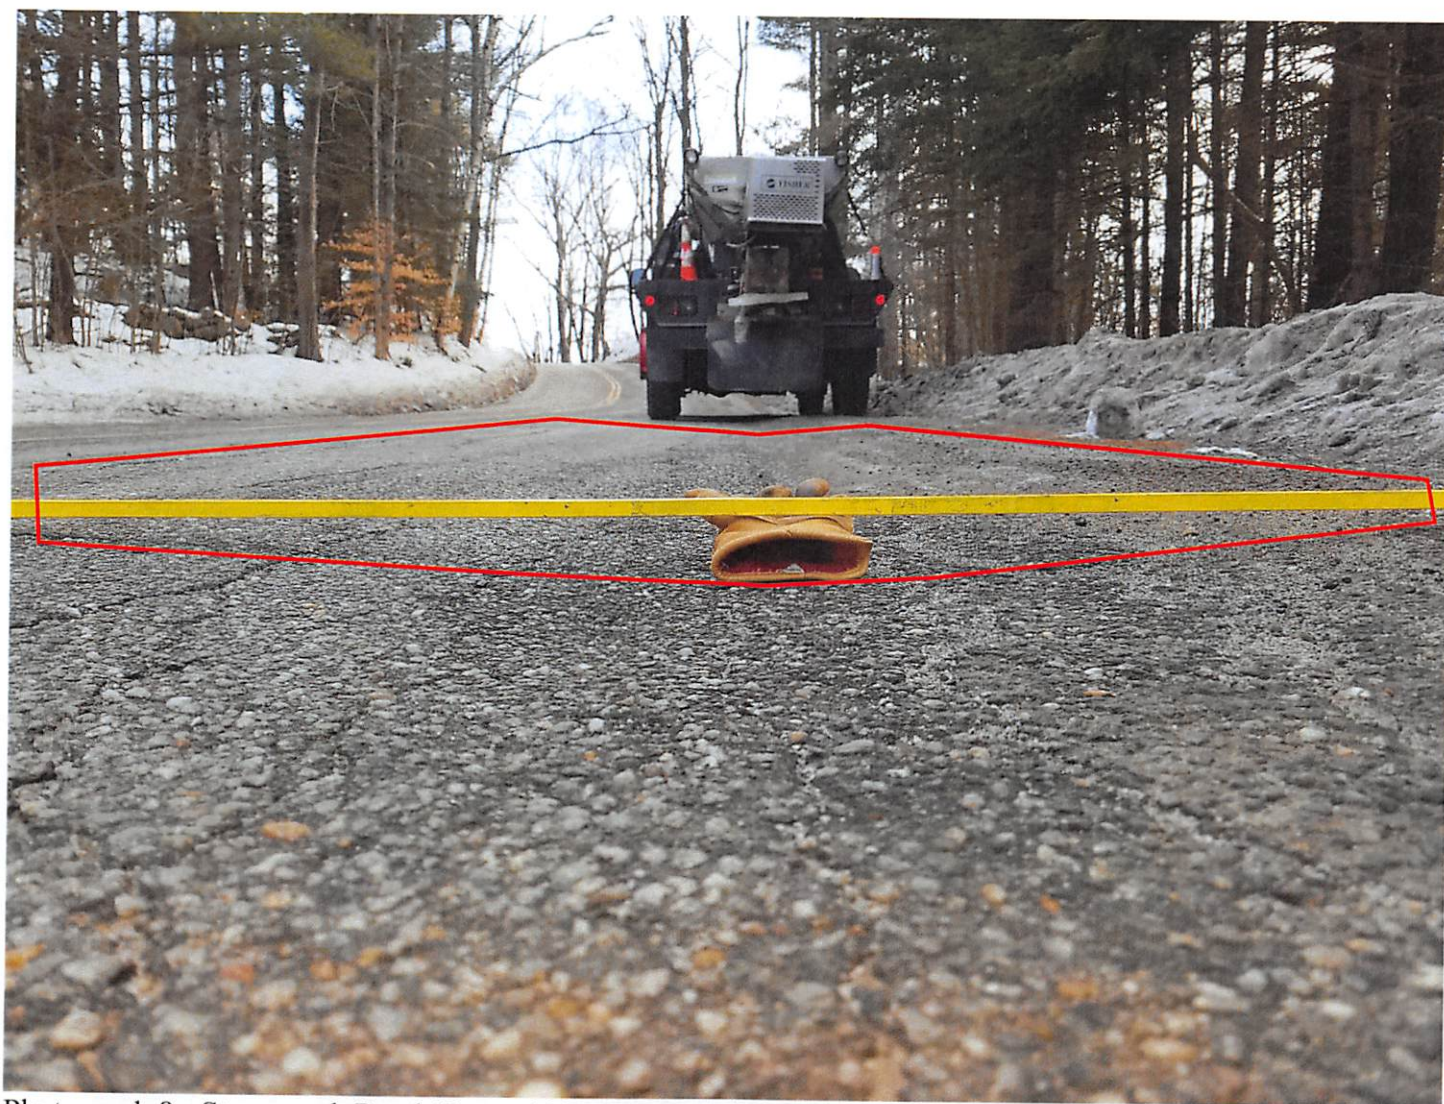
Stagecoach Road (Route 103B to Youngs Hill Road): This photograph depicts blocky cracking, early-mid stages of alligator cracking across the north lane, and a pavement patch in the south lane (date completed unknown). In most locations full-depth cracking and/or delamination of the wearing course from the base course of pavement was evident. The photograph also depicts 1-inch to 2-inch rutting along the center section of the road. This road condition, or a variant of it, is evident along the middle section of Stagecoach Road between Route 103B and the intersection with Youngs Hill Road.
